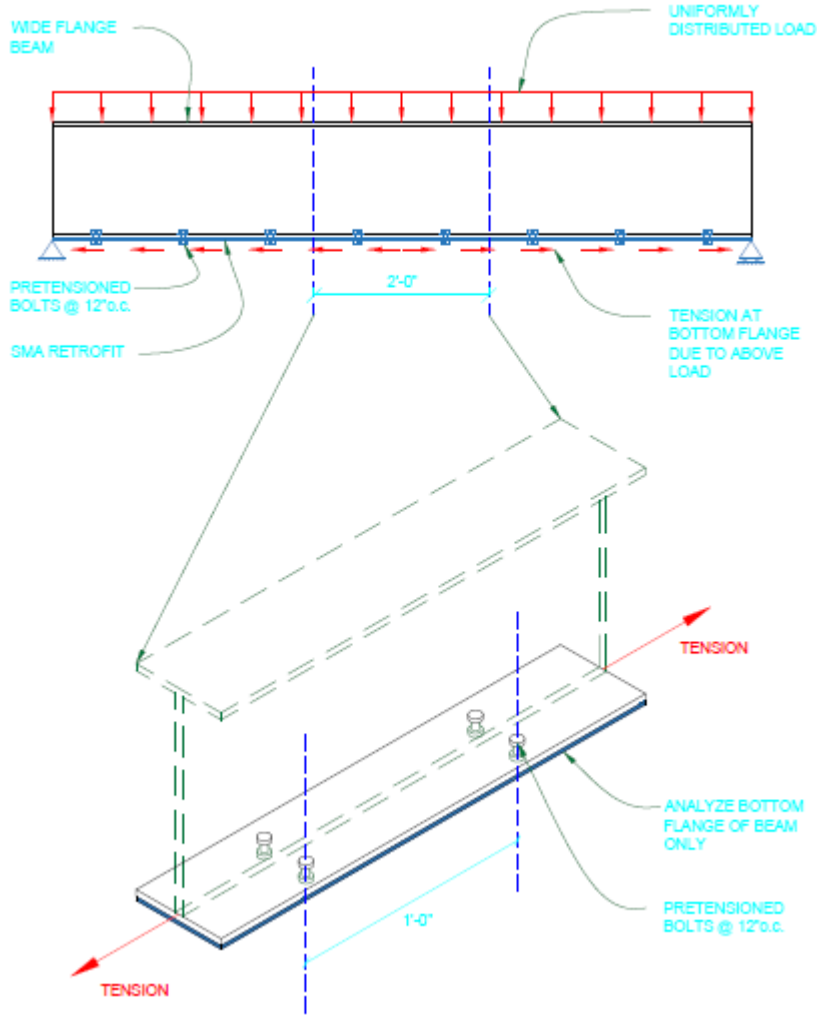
Pretensioned Bolted SMA Retrofit Anchorage Detail
